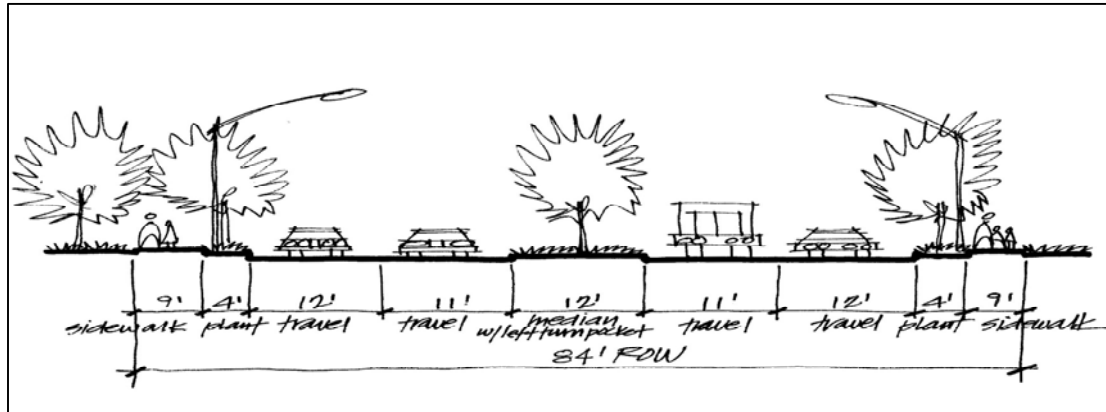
Bear Creek Parkway Extension: Typical Section
